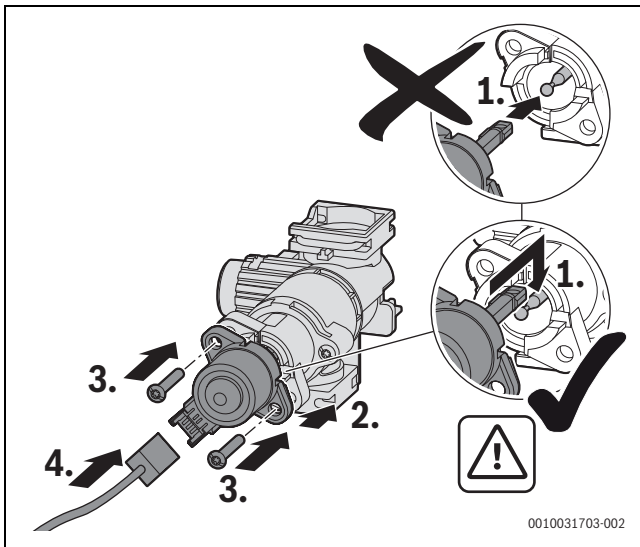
Installing the motor in the 3-way valve (variant with screws)
